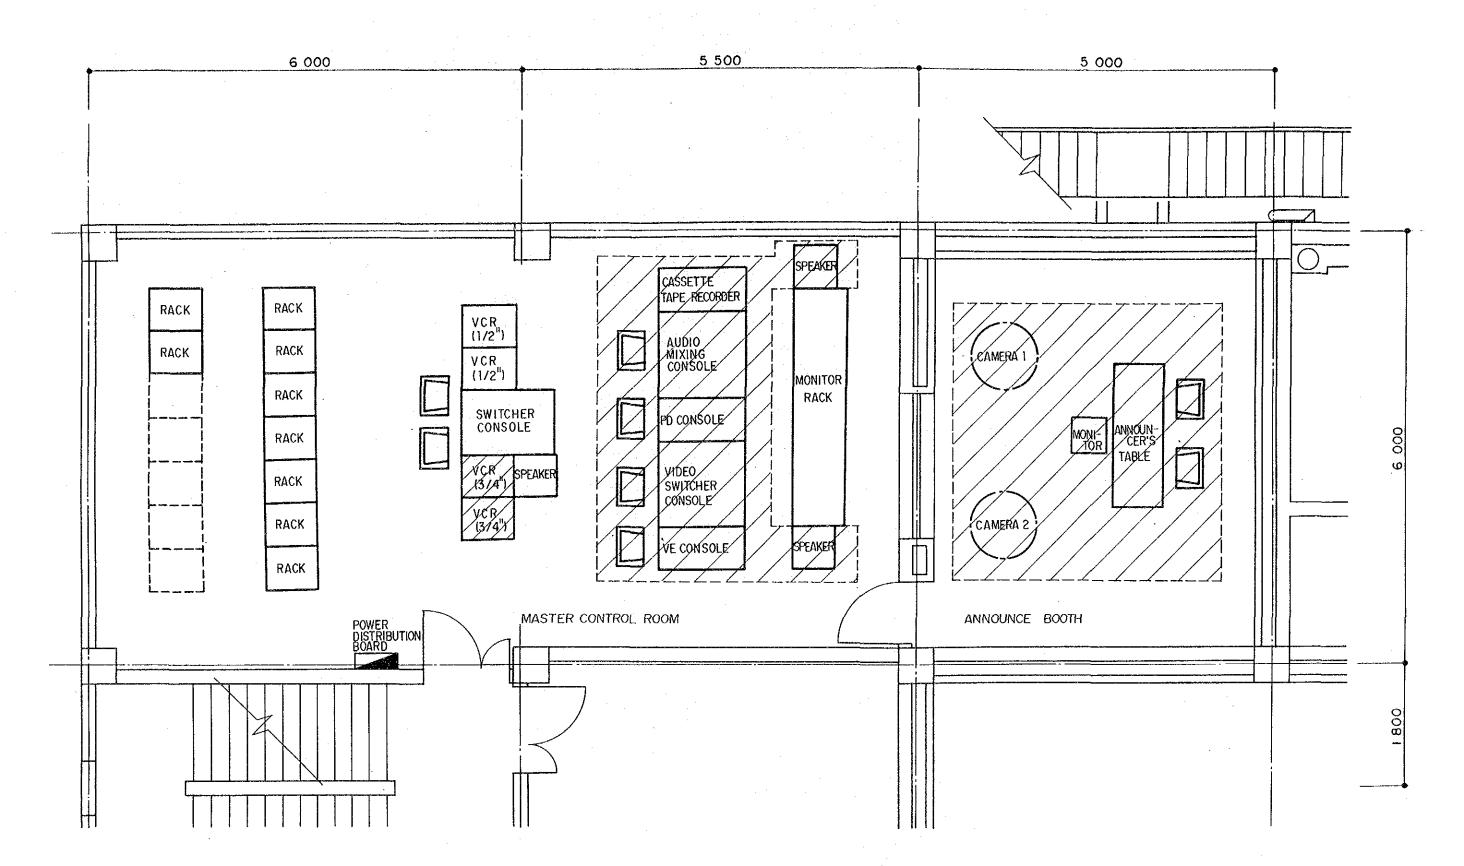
EQUIPMENT LAYOUT OF MASTER CONTROL ROOM
